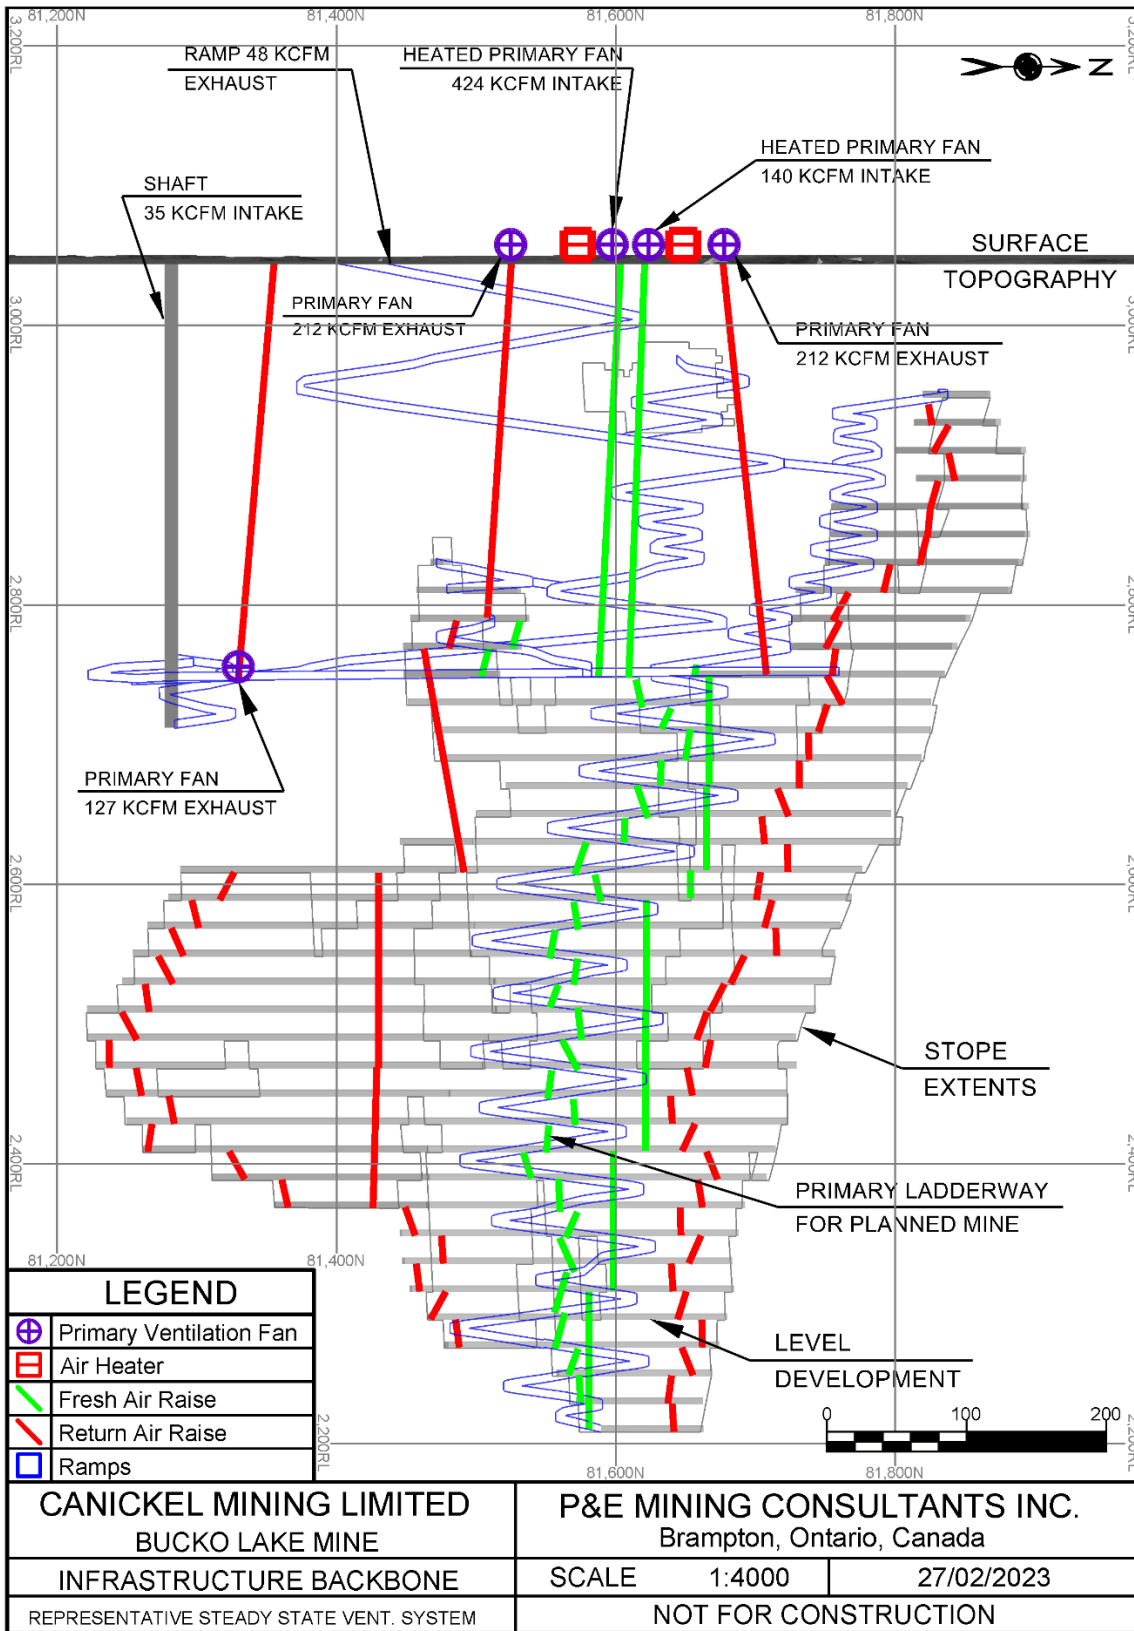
PROPOSED VENTILATION SYSTEM PLAN
